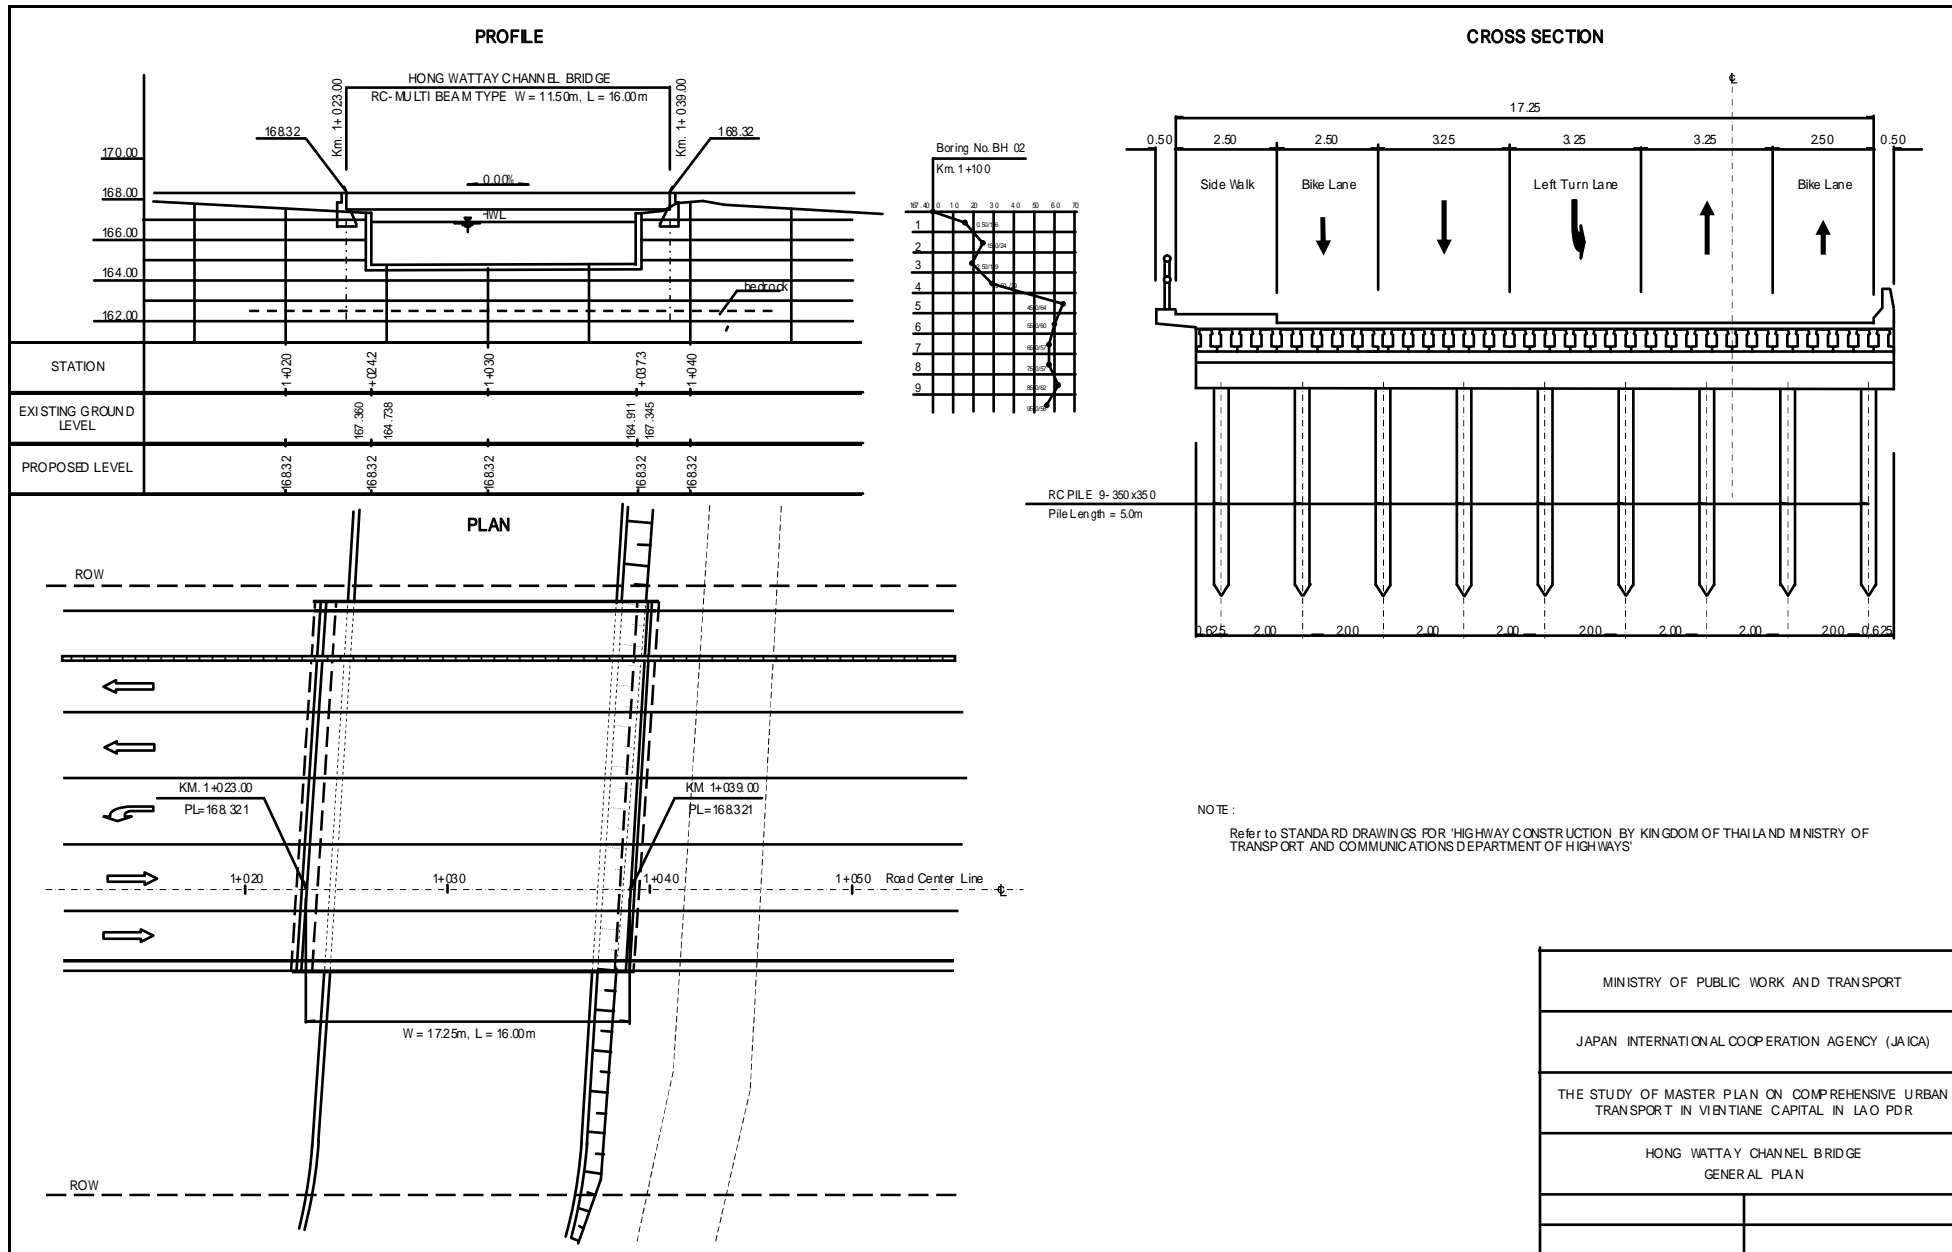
General Plan of Hong Wattay Channel Bridge
